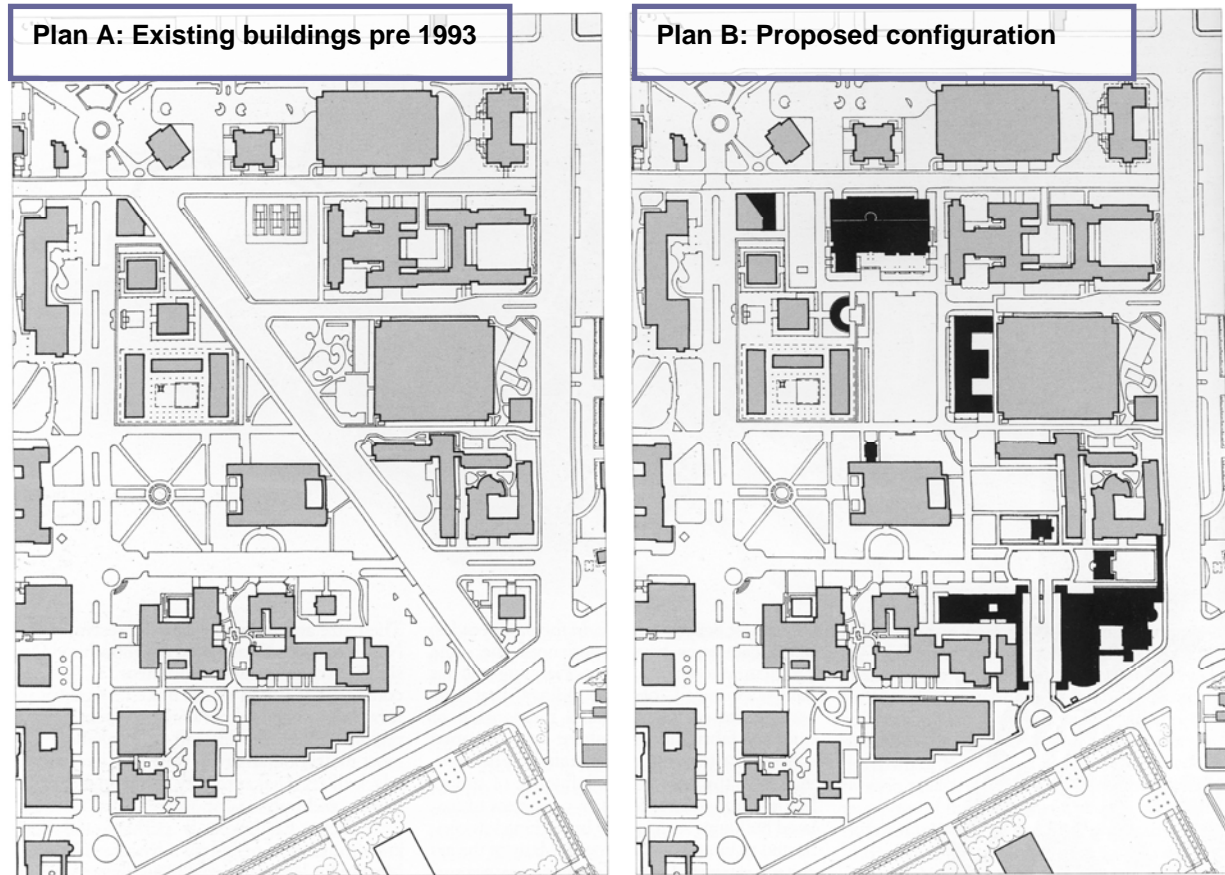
Section of the campus plan of the University of Southern California. Plan A shows existing buildings and street network prior to 1993. Plan B shows the proposed configuration of new buildings that would lead to the elimination of the diagonal road through the middle and the creation of a series of quadrangles within the existing campus. (Image Credit: Michael Dennis Associates. Need permission to use. Go through Dave Bagnoli).
